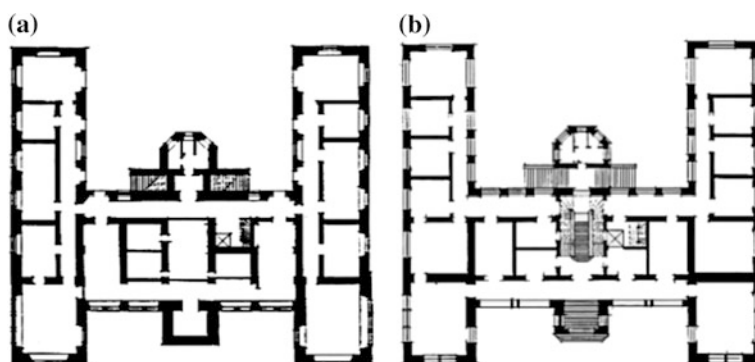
Pavilhão Mourisco's ground-level (a) and first-floor (b) plans, respectively
